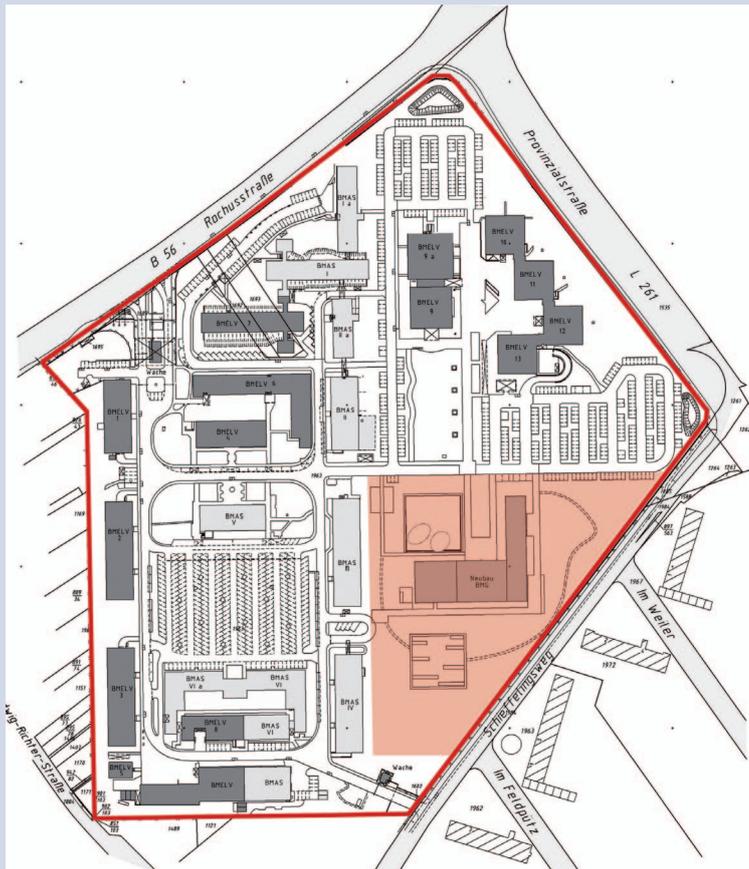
Site plan – Construction site of the Federal Ministry of Health on the Rochusstraße property in Bonn
